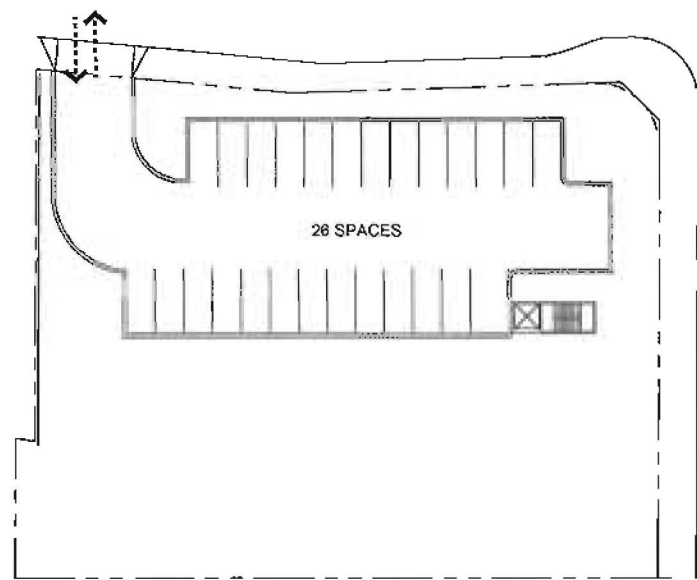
Development Concept Plan = 1st/ Boyle = Site No. 1
